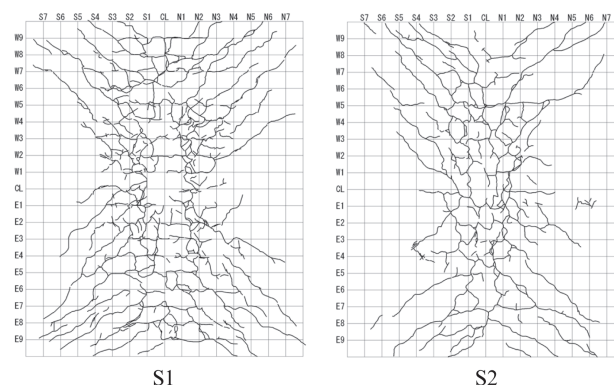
Crack pattern of concrete slab after 50 000 times loading
